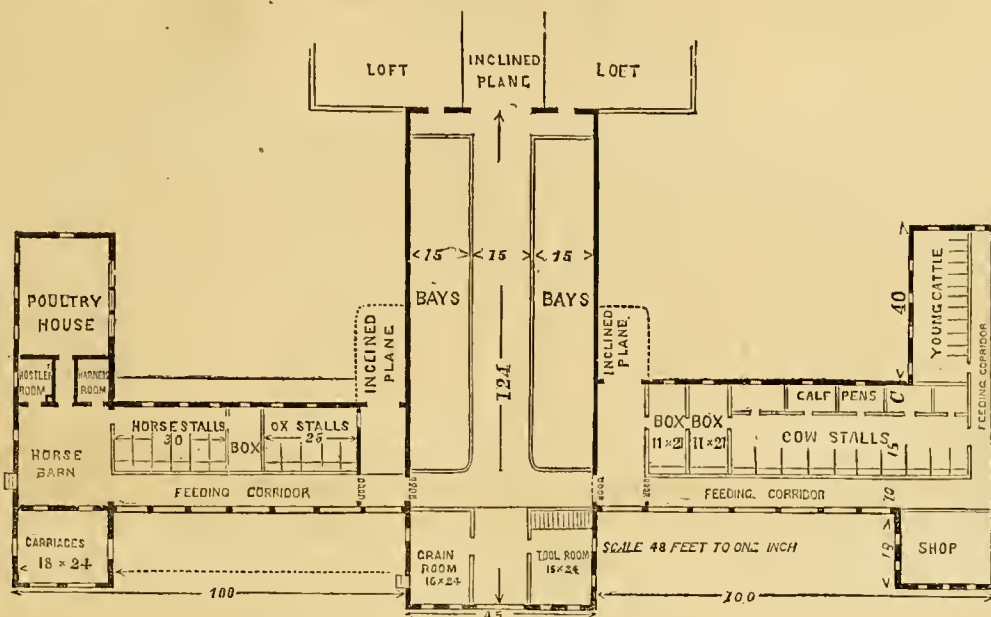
PLAN OF PRINCIPAL FLOOR.
